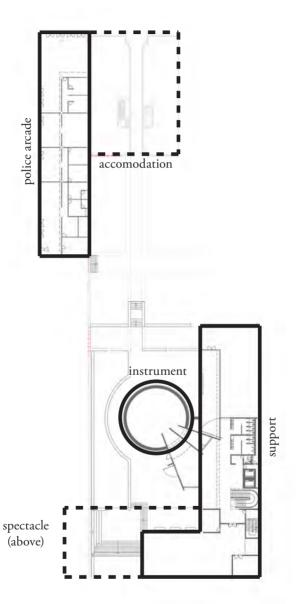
3 - Artefacts arranged as on Basement Plan (Source: Author)
